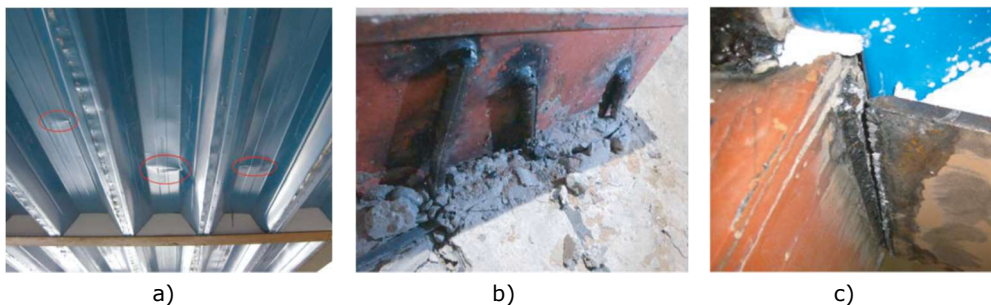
Progressive damage to the test specimen of Yang et al. [41]: a) buckling of steel sheets; b) example of reinforcement bar fracture; c) lower beam flange-to-column weld failure
